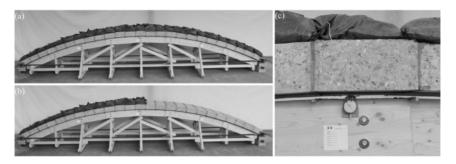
Load testing stage: (a) full span loading, (b) half span loading, (c) deformation measurement.
